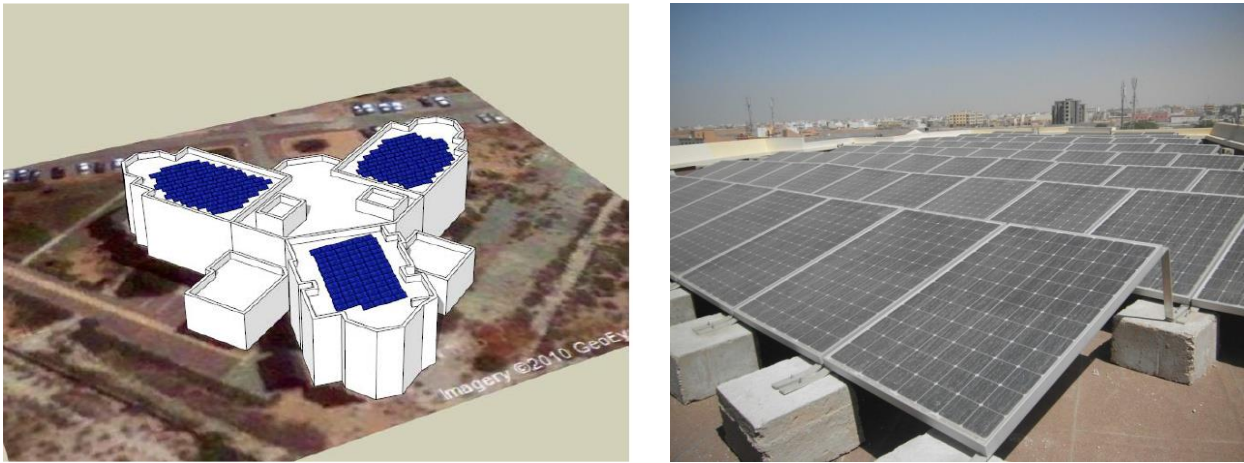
PV roof system installation of the MPED (building configuration and PV installation)
